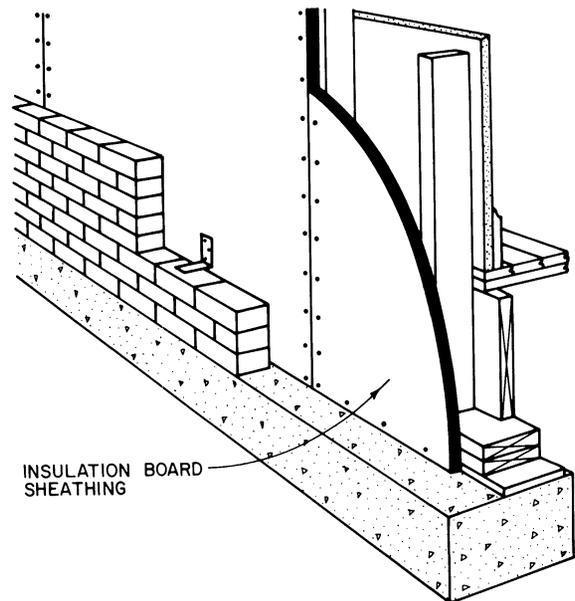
Combination of insulation board sheathing and masonry veneer; 1/2-inch spacing required between face of sheathing and back of masonry veneer (Celotex Corp.). Metal wall ties required at rate of one tie for every 160 to 260 in² of wall area. Ties are nailed through sheathing into studs.
